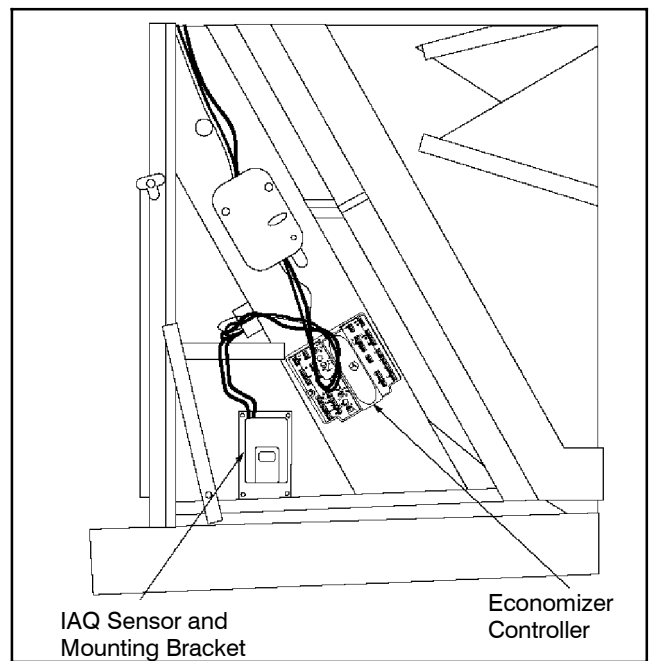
CO₂ Sensor Location - PGH/PAH155-180, PGS/PAS180-300, PHH150-180
